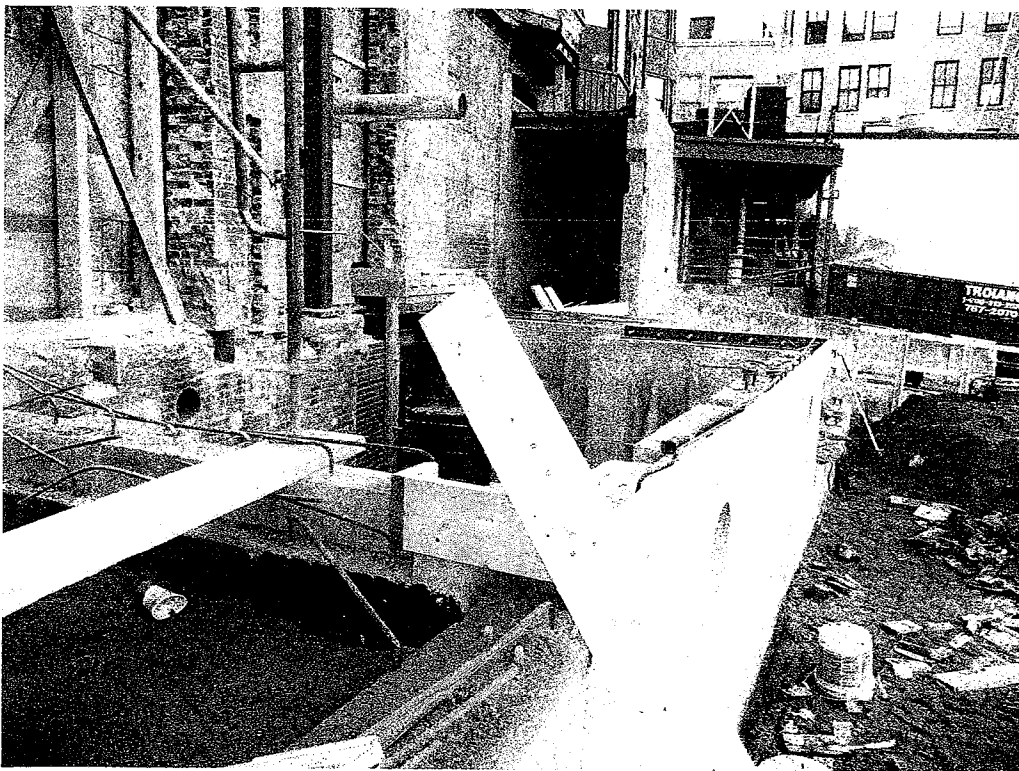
Preparations being made for installation of structural steel floor framing and elevated slab.
